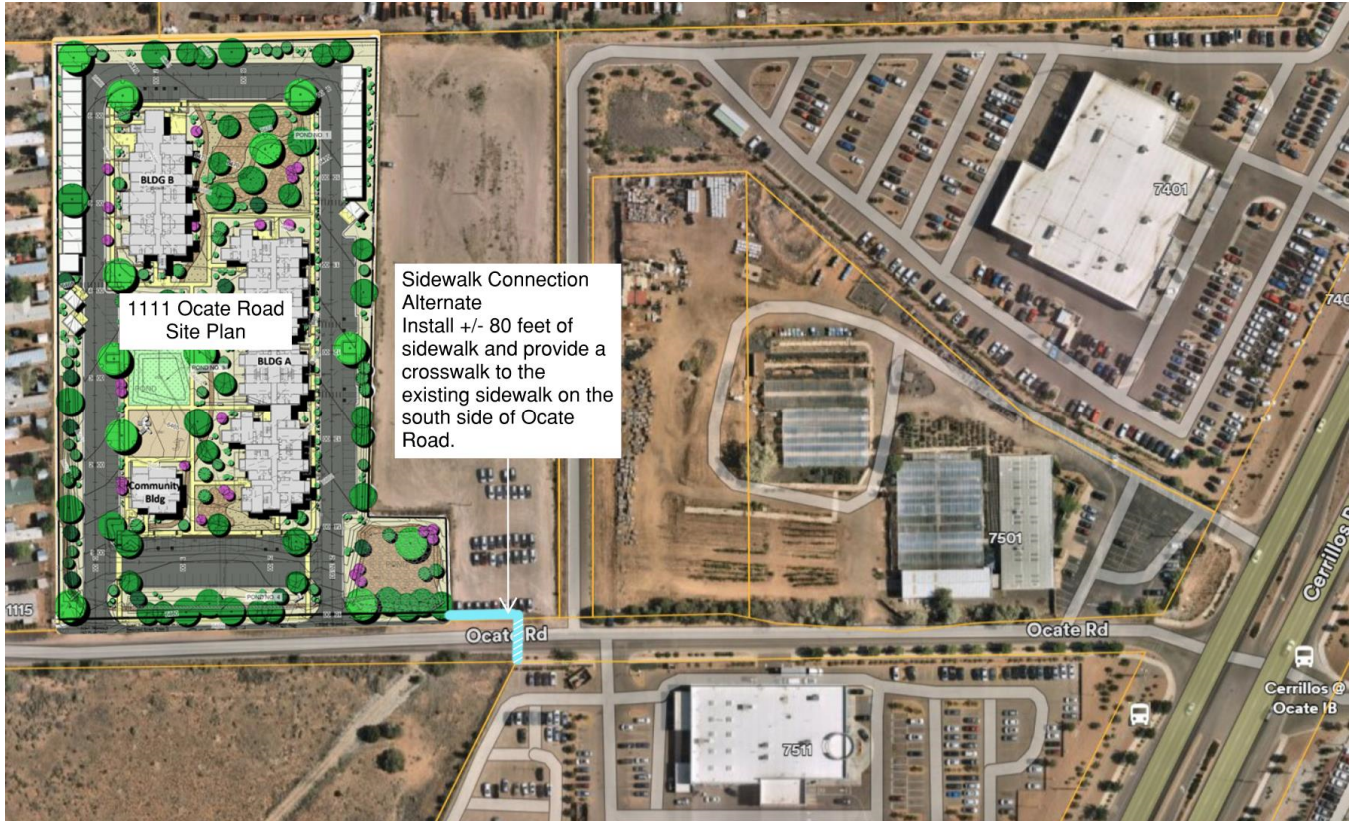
Access and Off-Site Sidewalk – Preferred Option
